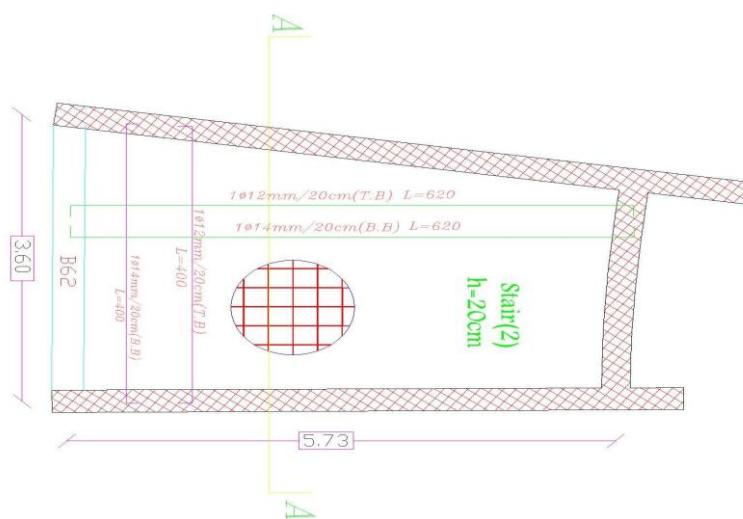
Solid Slab (Stair Slab(2)) Details
